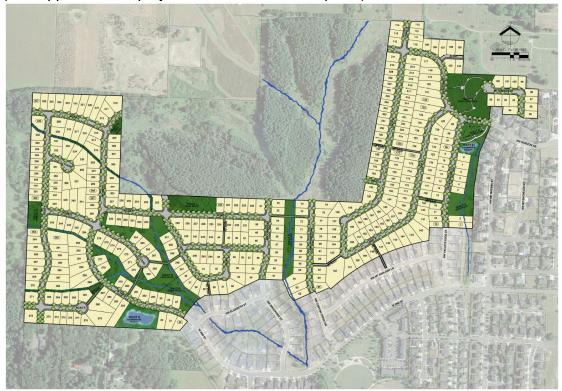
Plan as Proposed with Planned Development Amendment (PDA 1-24), with Aerial Photo and with Features Depicted
